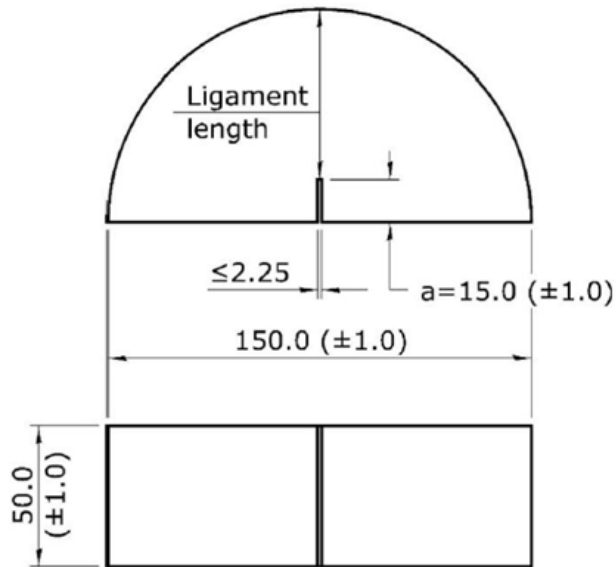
Final Dimensions of an I-FIT Specimen (All dimensions are in mm).
